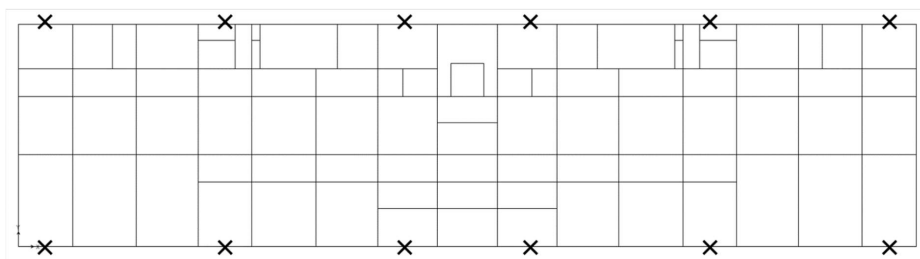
Damper Placement at 2nd floor (R-X); MSSSA: 0 damper, ODAM: 12 dampers
